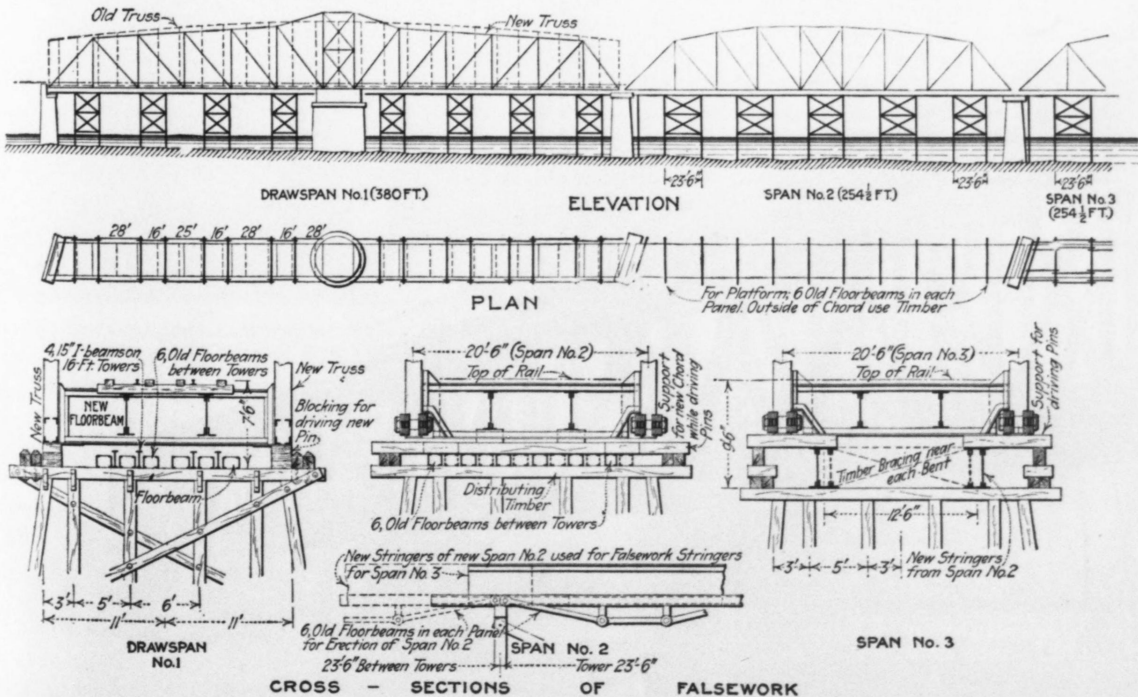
FALSEWORK AND PLATFORMS FOR THE 380-FT. DRAWSPAN AND TWO 254 1/2-FT. FIXED SPANS
